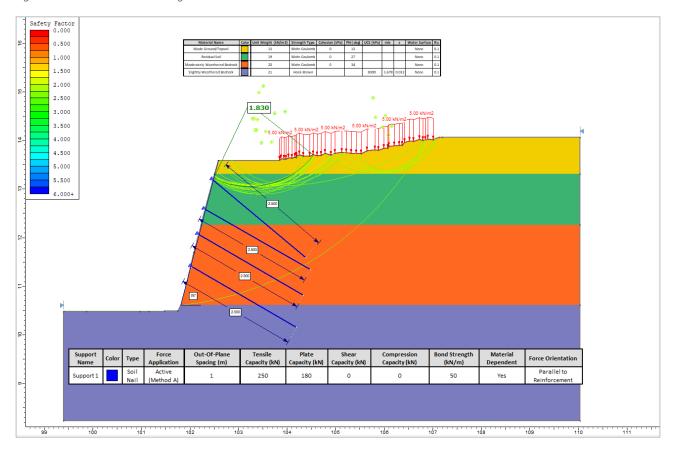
Section 6 – Soil Nailing - BS8006 Set2
